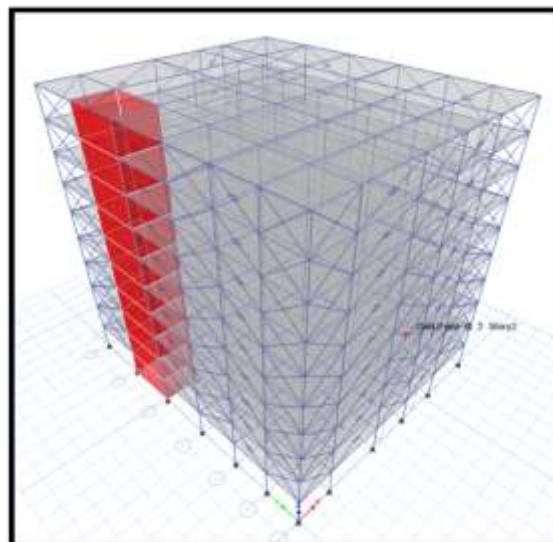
3D view of RC Building with X bracing and Friction Damper
